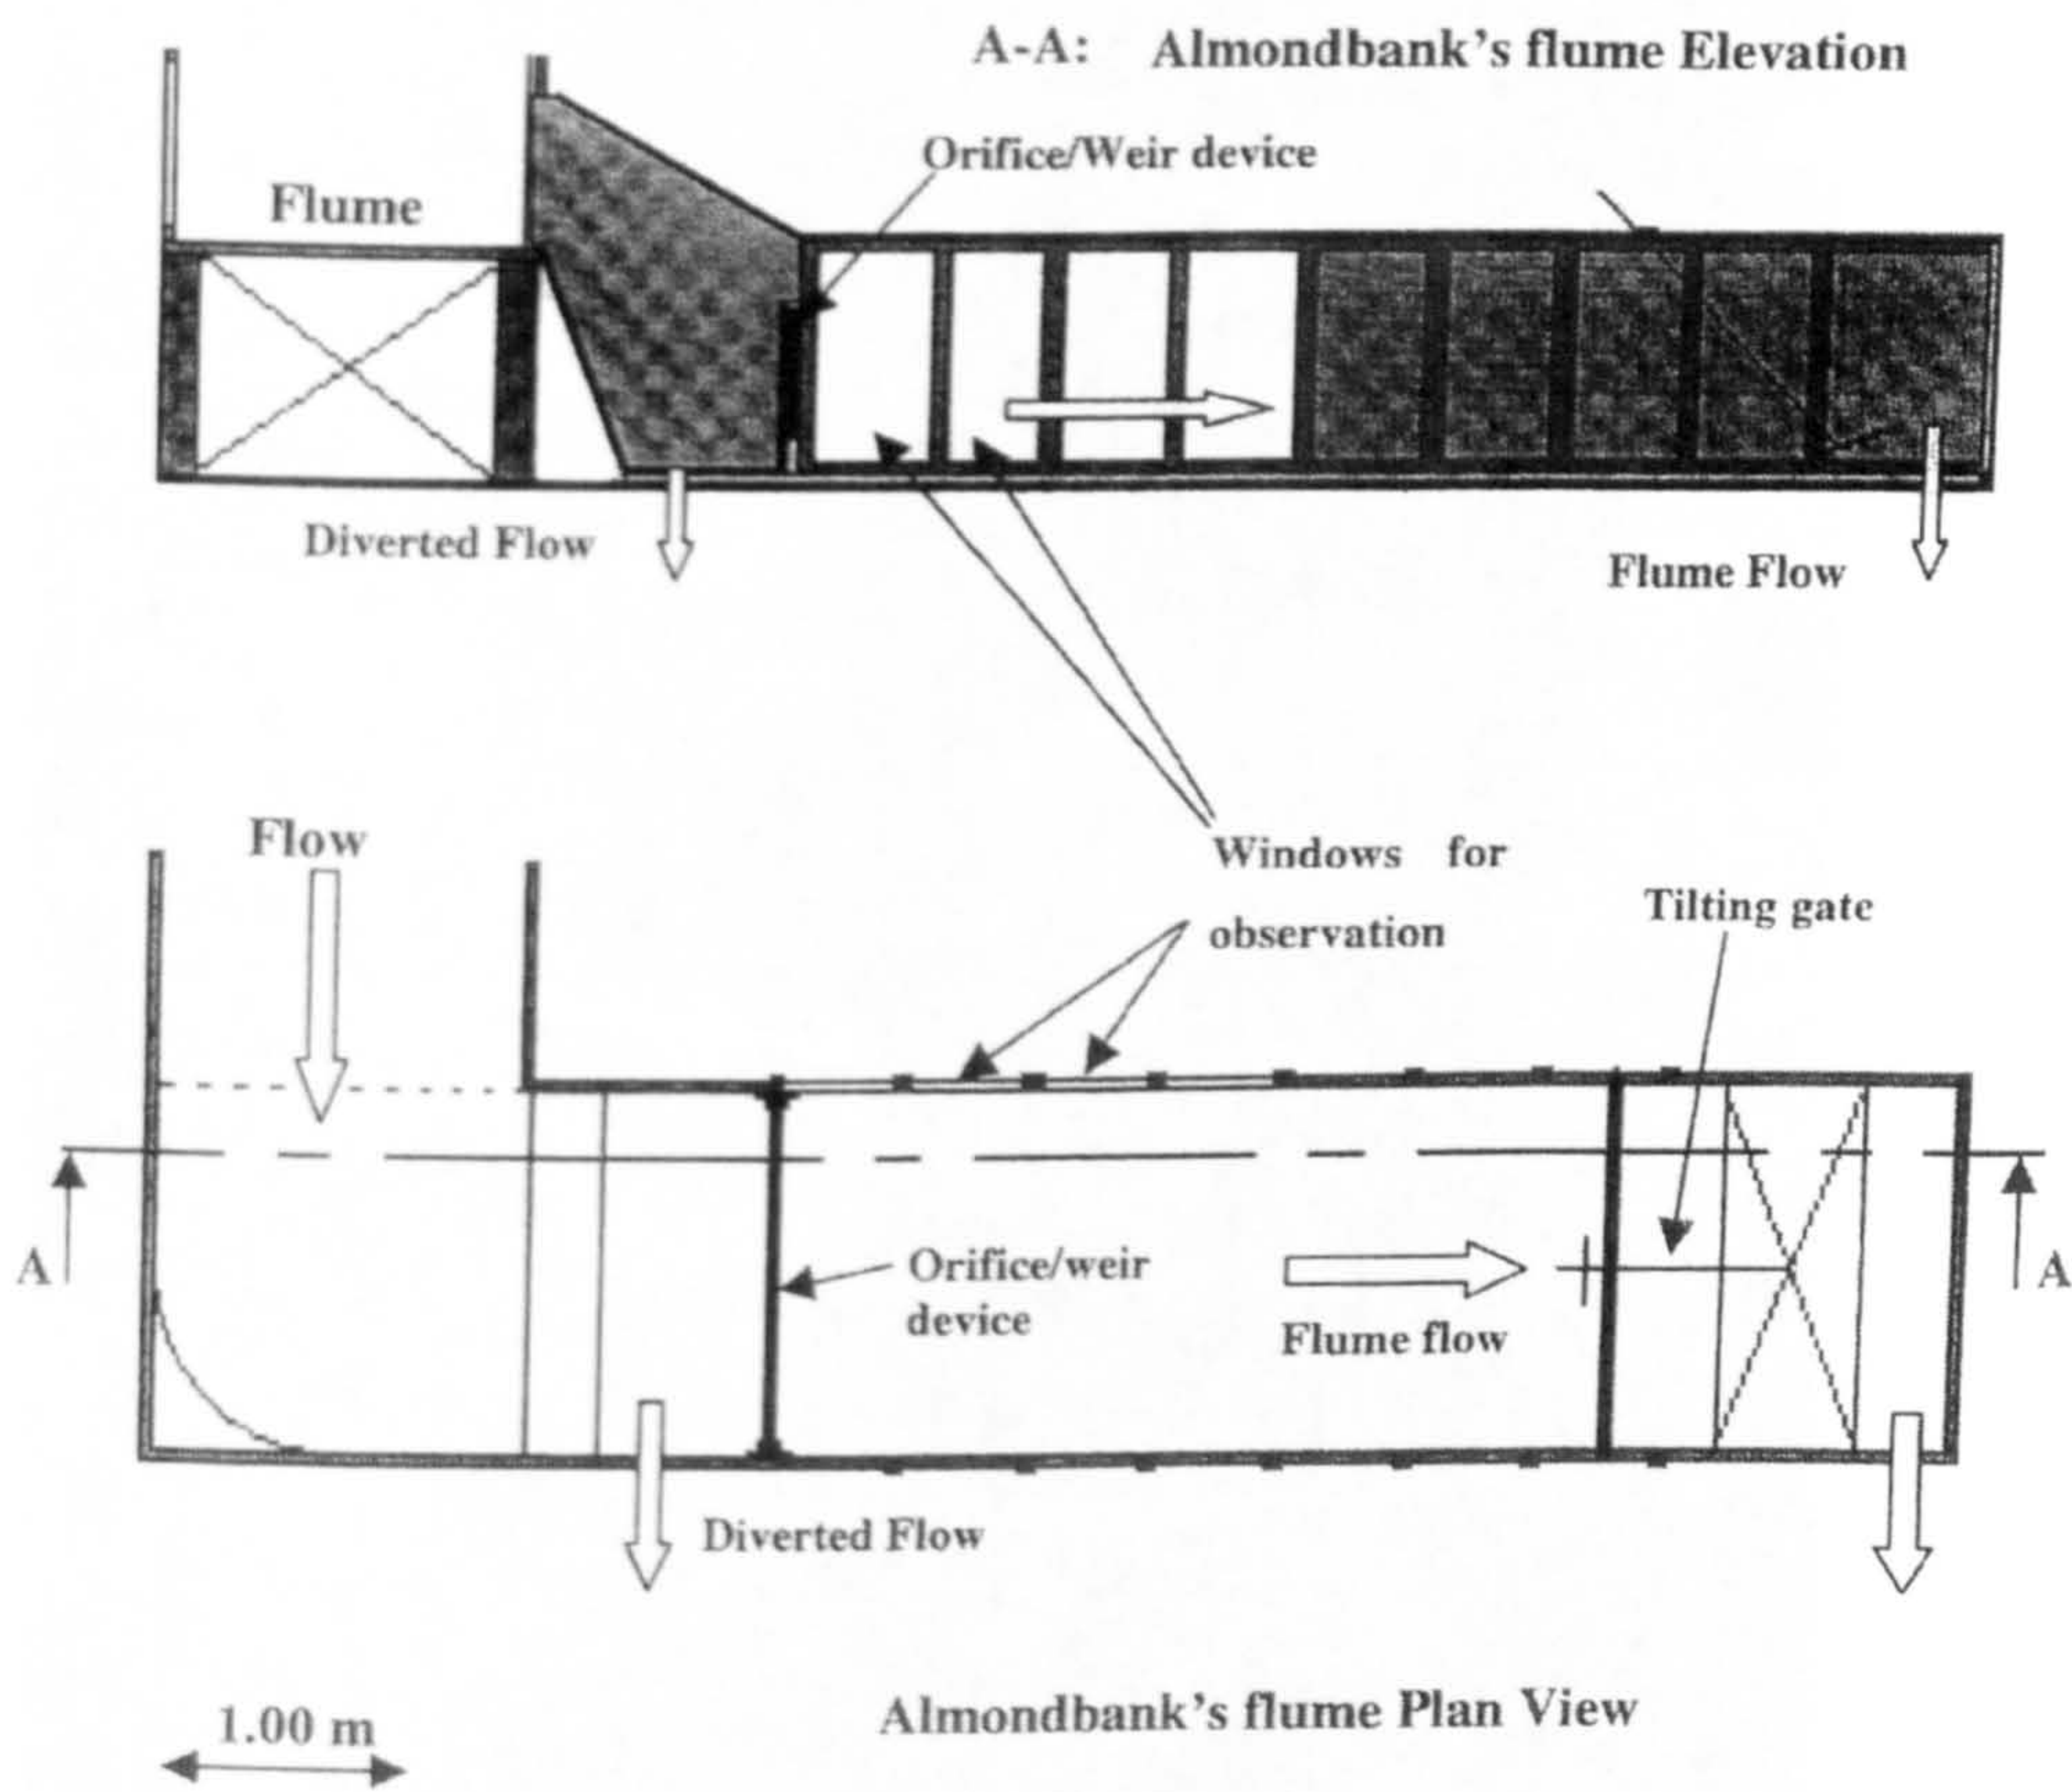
Schematic of plan and elevation views of Almondbank Flume
